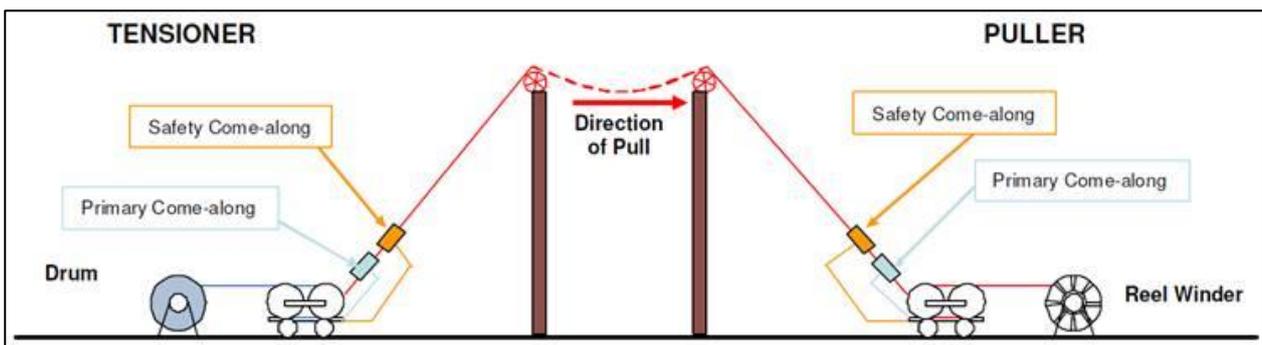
Typical Tension Stringing Layout (Illustration Courtesy of ESNB)
